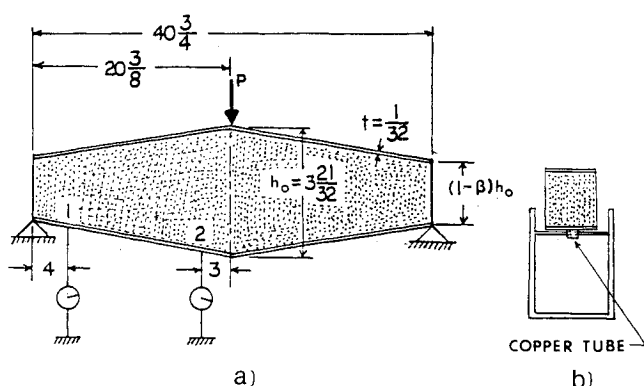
Sandwich beam test specimens: a) side view; and b) end view (all dimensions are in inches; width perpendicular to paper = $2\frac{11}{32}$ in.).
